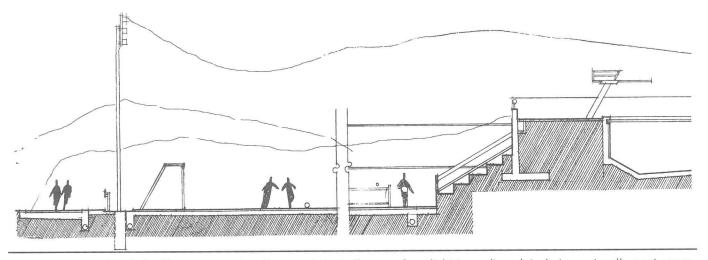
Athletic facility pavements. Pavements typically range from light to medium duty, but occasionally must accommodate heavy duty exposition vehicular loads. This group of pavements are commonly associated with track, field, court, and arena settings. Installation costs are high due to special subgrade preparation and drainage requirements, and long term maintenance is high due to uniformity requirements, specialized equipment, and proprietary surface specifications.
